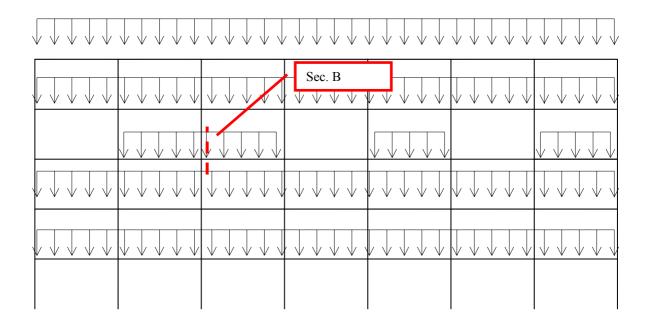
Distribution of variable loads on the floors for minimizing the negative bending moment in joint section B.
